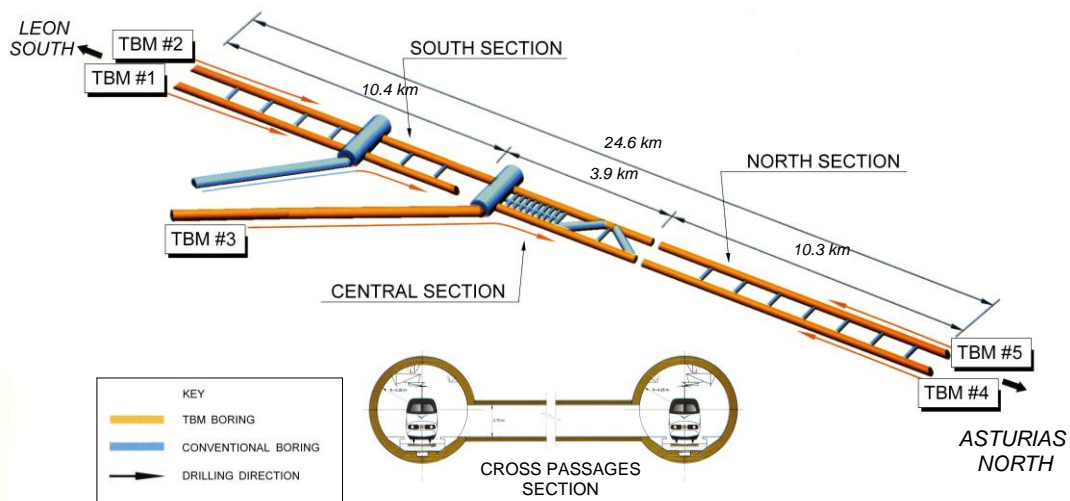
Pajares Tunnels project overview (modified from adif.es)
